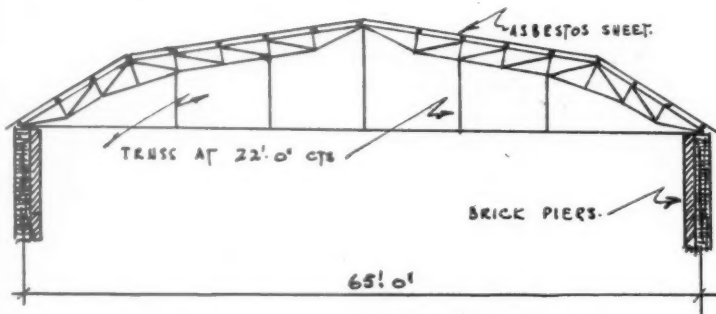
Composite tubular roof truss used in conjunction with brick construction.
